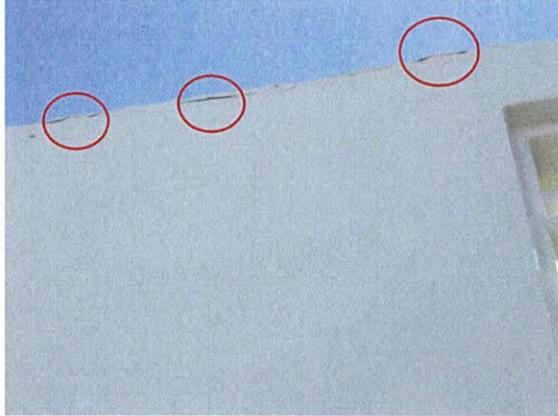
Openings at wall cap of machine room at the roof level caused by stresses produced by Irma's strong wind pressures.
